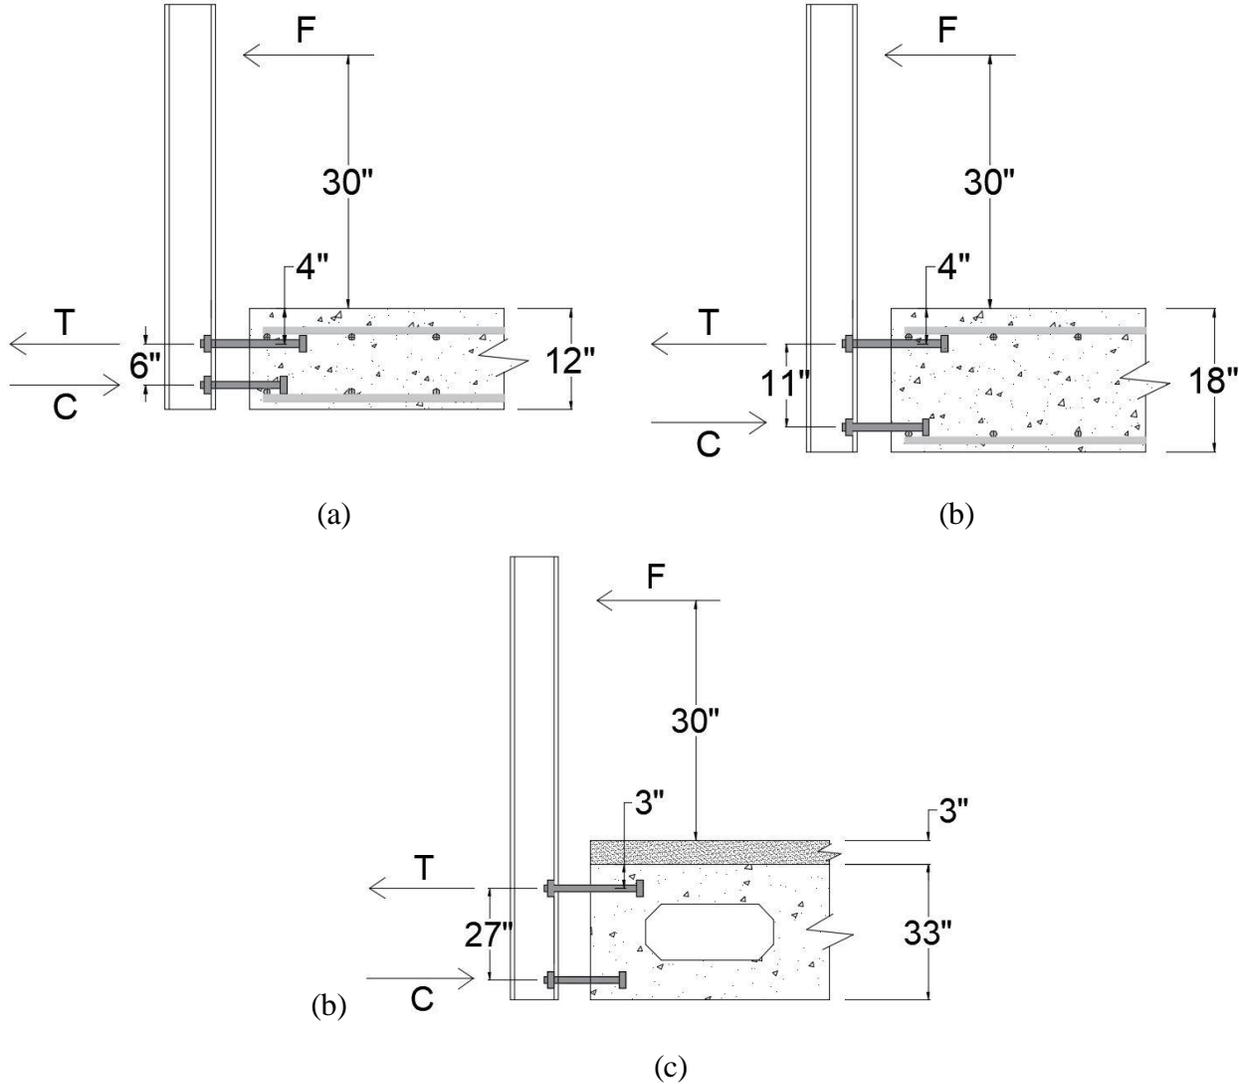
(a) 12-in. (305-mm) Slab Deck Design, (b) 18-in. (457-mm) Slab Deck Design, and (c) 33-in. (838-mm) Deep Concrete Box-Beam Girder Design
